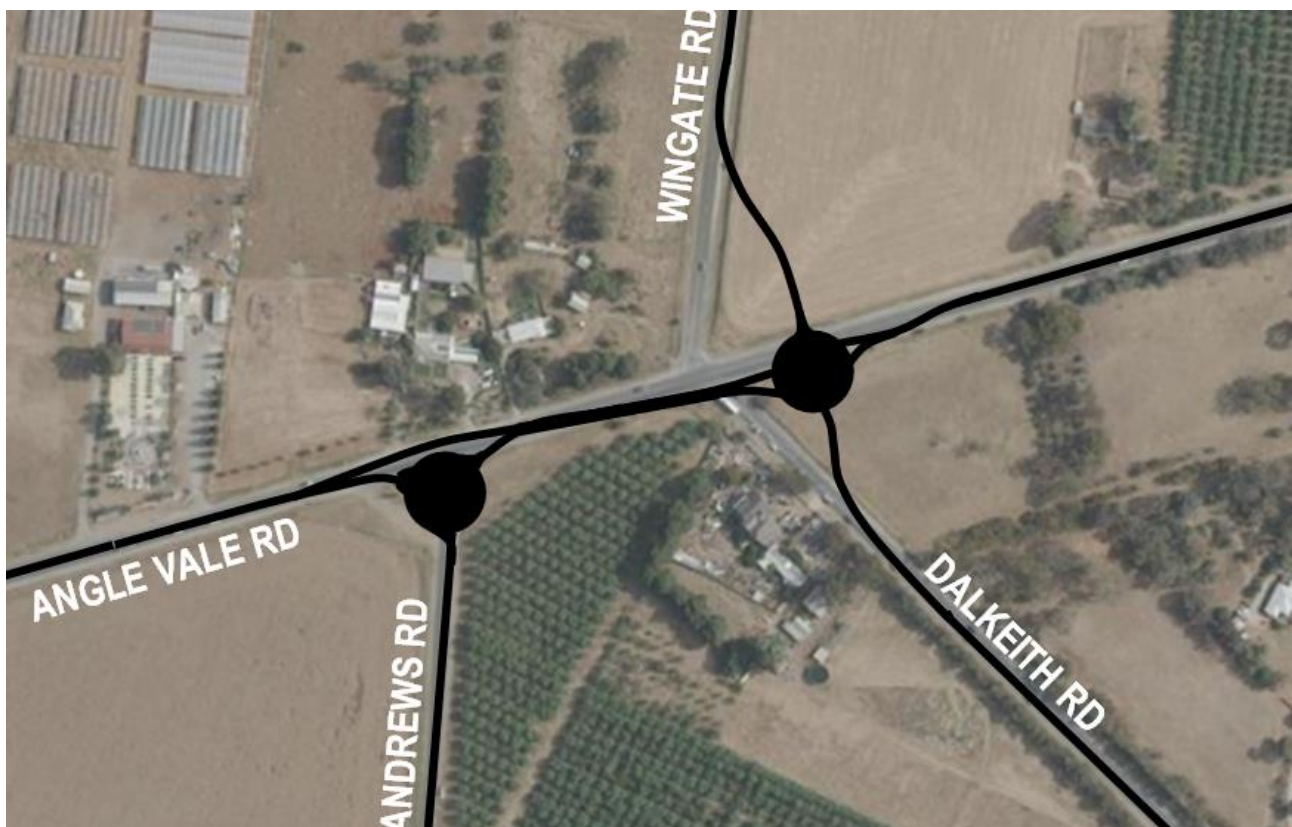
Layout sketch of a dual roundabout upgrade at Angle Vale Road/Andrews Road/Dalkeith Road
